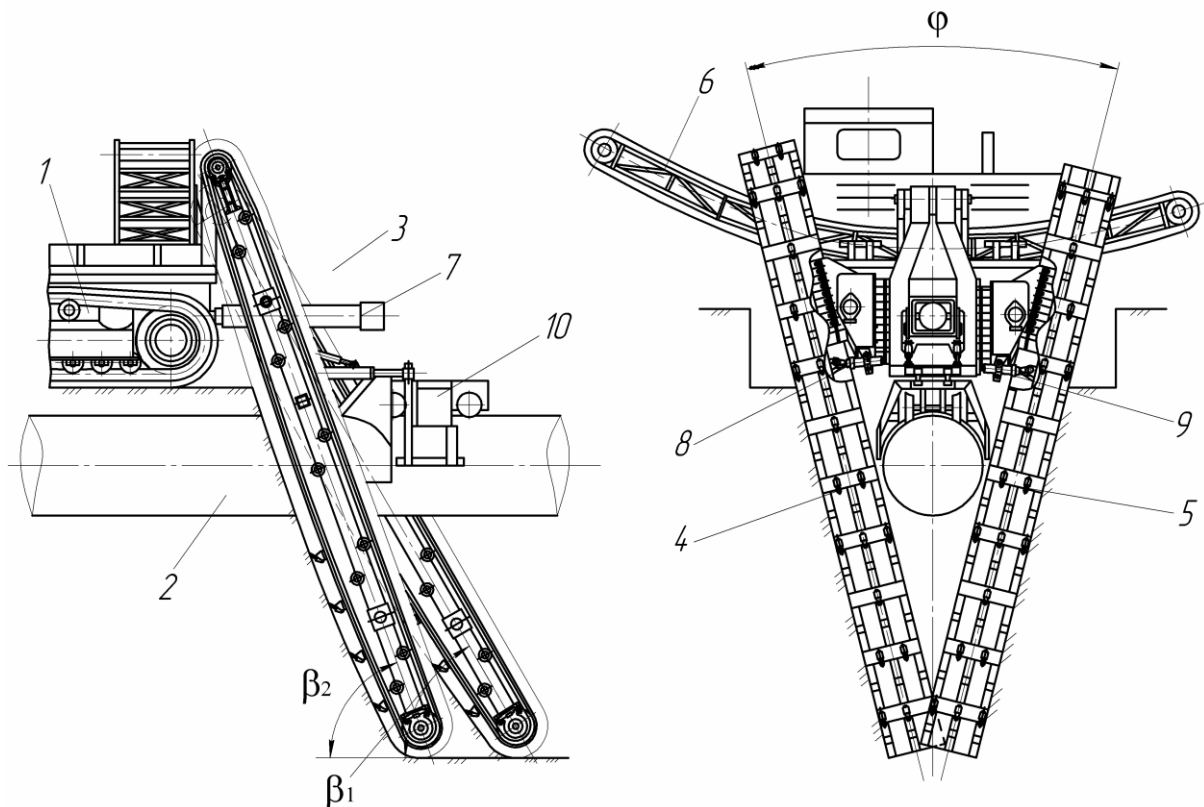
Chain trencher: 1 – base machine; 2 – pipeline; 3 – working equipment; 4, 5 – chain section; 6 – conveyor; 7 – 9 – hydraulic cylinders; 10 – control devices
